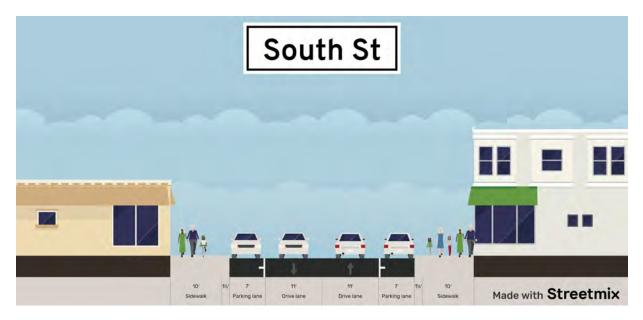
Proposed Cross Section for South Street from Westnedge Avenue to Portage Street
